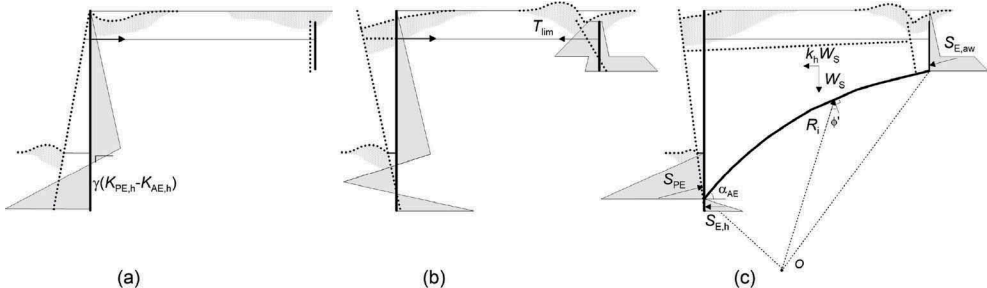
Potential plastic mechanisms due to the soil failure, together with the corresponding layouts of forces: (a) toe failure; (b) anchor failure; and (c) global failure.
